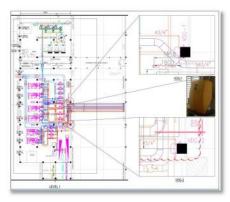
Vacuum degasser layout with photo of actual units installed at site
